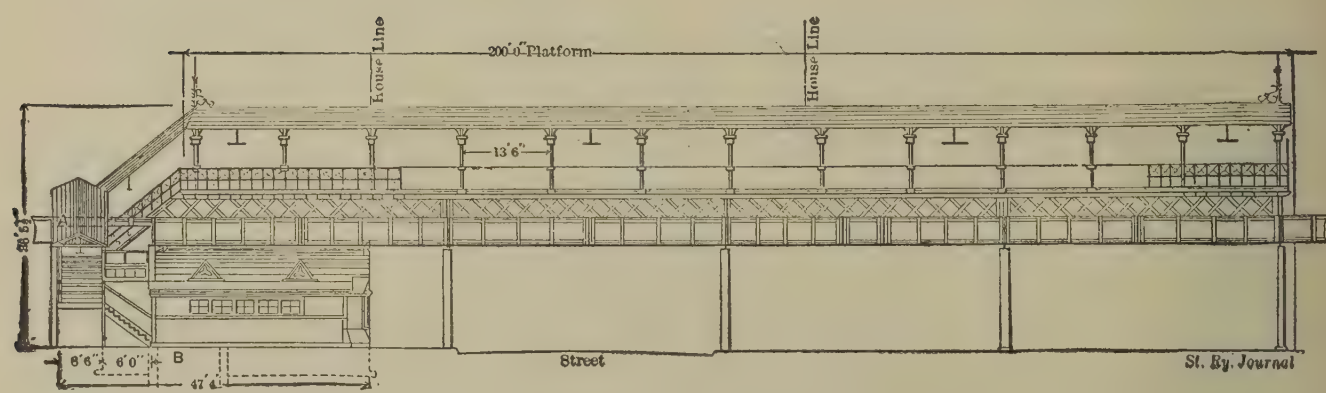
SIDE ELEVATION PLATFORM OF FIG. 380.
